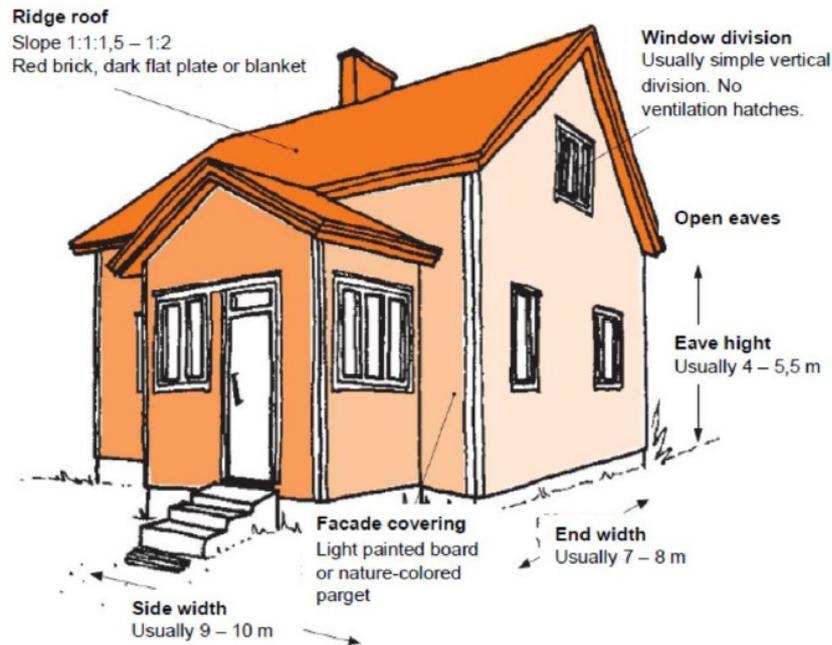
Typical house from 1940's and 1950's, so called Veteran house. [2]
